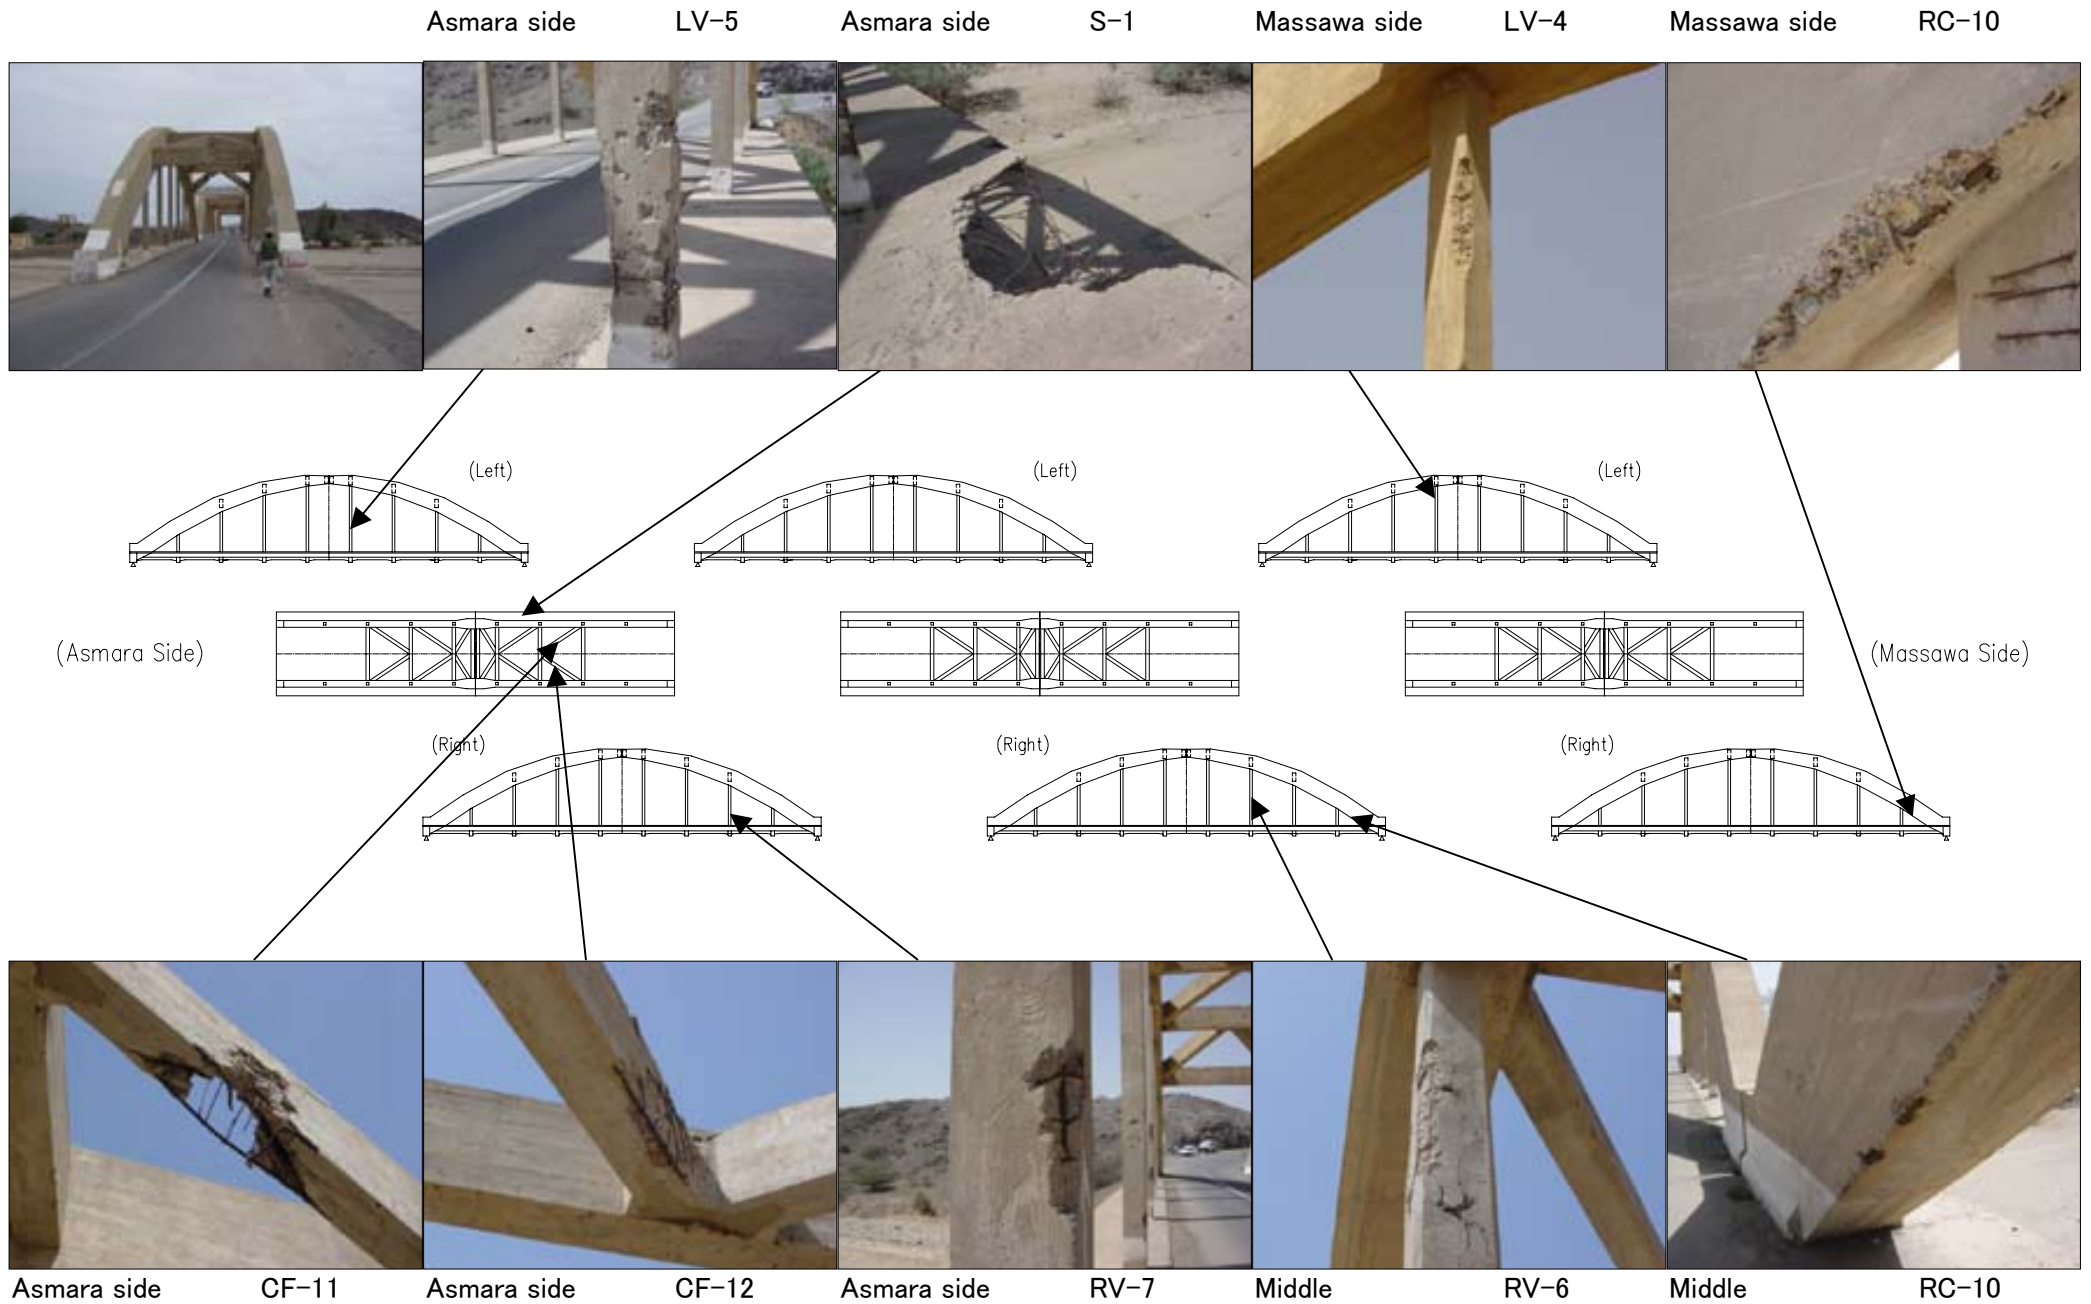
Actual Bridge Condition of Emculu Bridge
